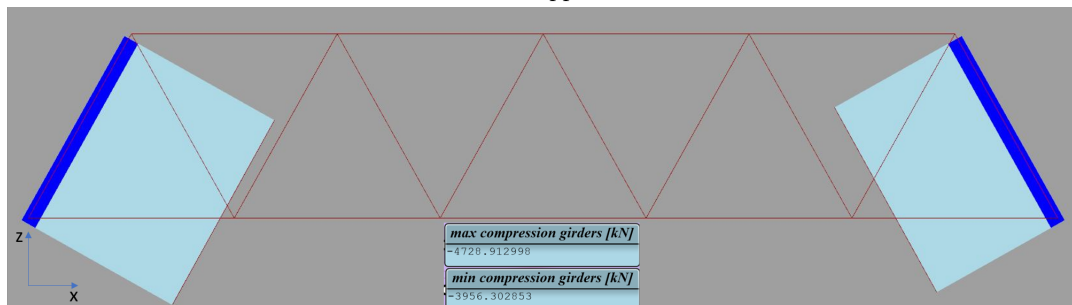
Geometry of the truss bridge with section properties as modelled with Karamba
